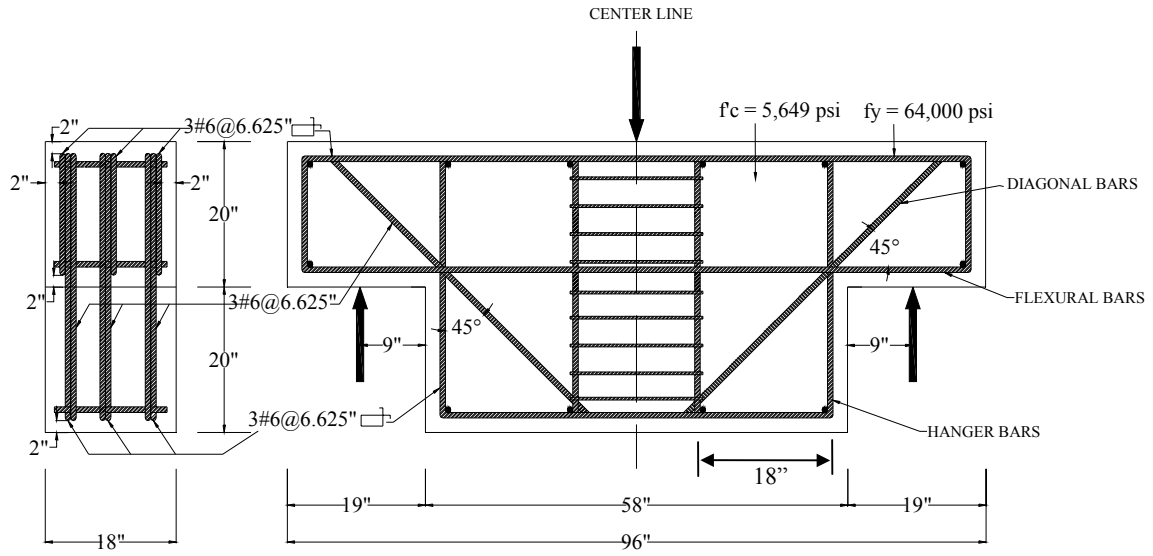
(a) Dimensions and steel arrangement of Specimen T5
